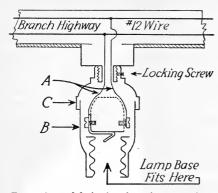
Method of tightening loose socket. "A" (conducting wires) should not be twisted. Socket may be tightened on fixture by removing shell "B" where it joins cap "C." Cap "C" may then be screwed on tightly to fixture and held in place by locking screw shown at right. Shell "B" is then replaced. (Be sure current is "off" before tightening socket)
